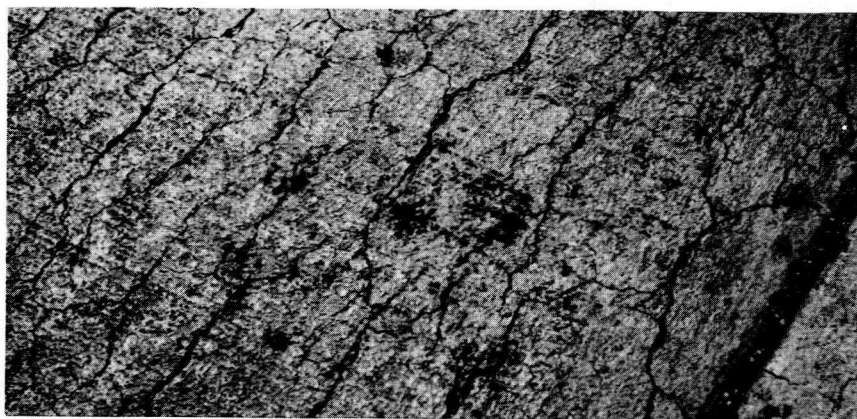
Advance deterioration in a concrete floor slab. While not a "pavement failure" it demonstrates that such failures can develop in slabs submitted to no load heavier than pedestrians.
